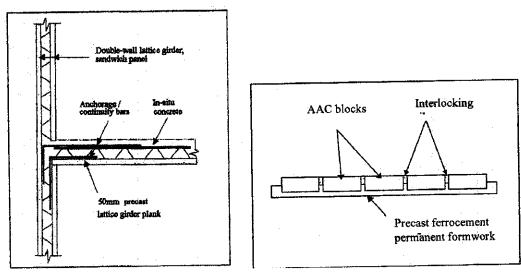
JKR Lattice Girder Sandwich Panel (Category: New and emerging)
